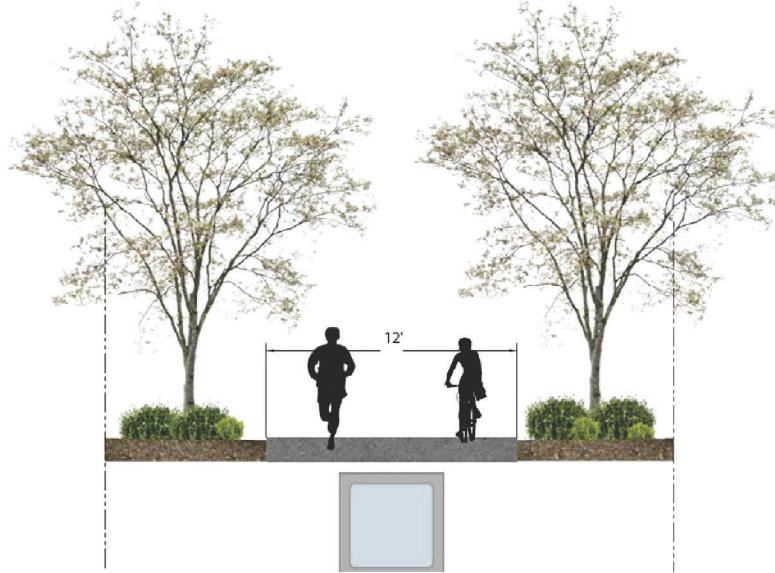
East Jordan Canal Trail typical sections of trail over canal enclosure.
